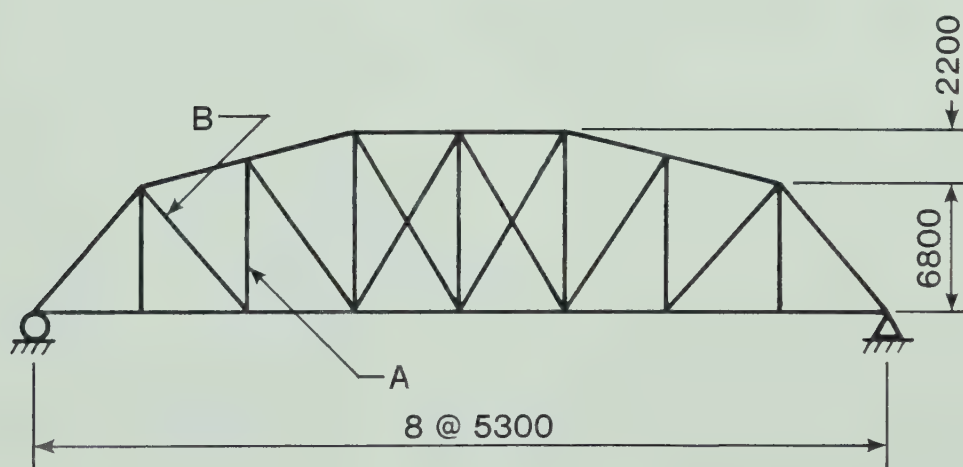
Bridge Geometry and Location of Actual Riveted Members Tested
